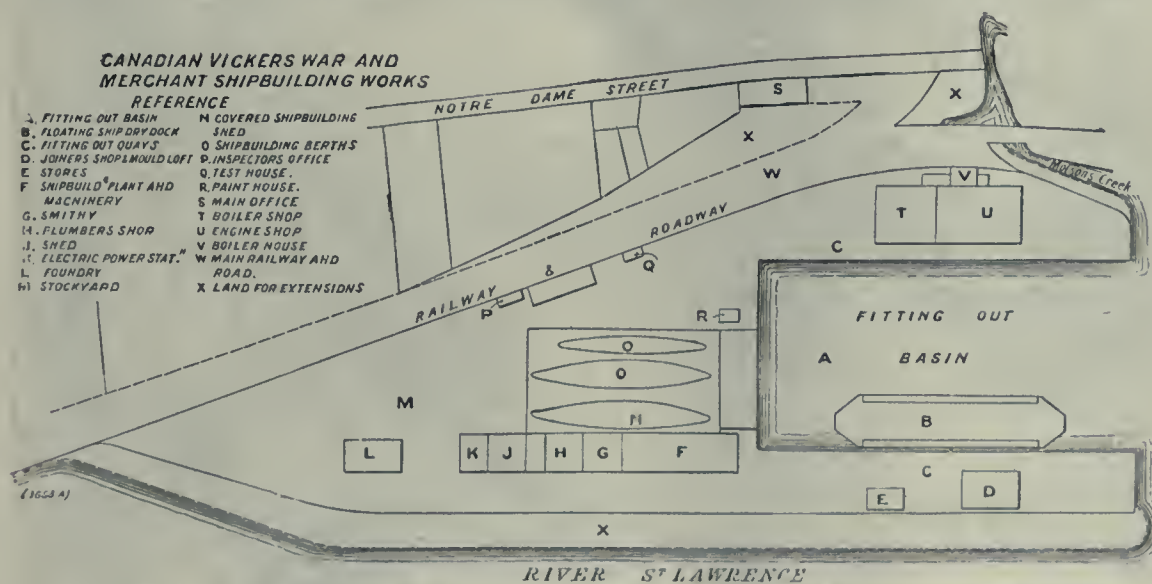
GROUND PLAN OF CANADIAN VICKERS SHIPBUILDING WORKS AT MONTREAL.
